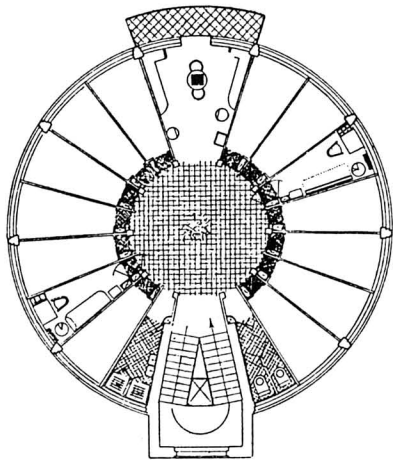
Kotsar (Vkhutein): Bachelor apartments. Plan.
